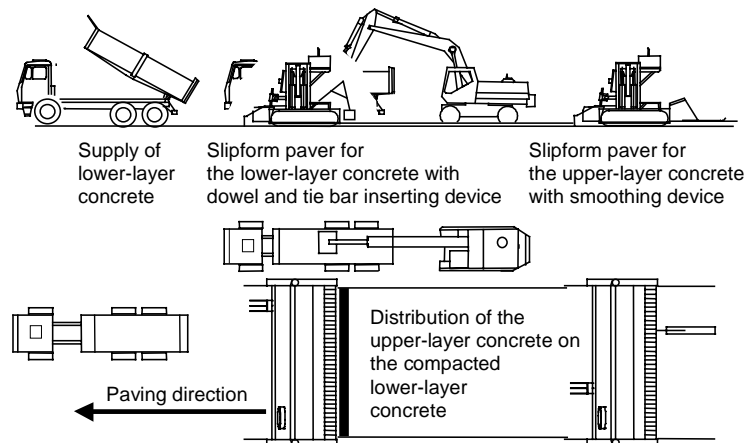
Slipform paving train consisting of two slipform pavers for construction of concrete pavements in two layers; the concrete for the top layer is placed in front of the second paver by an excavator from the side
